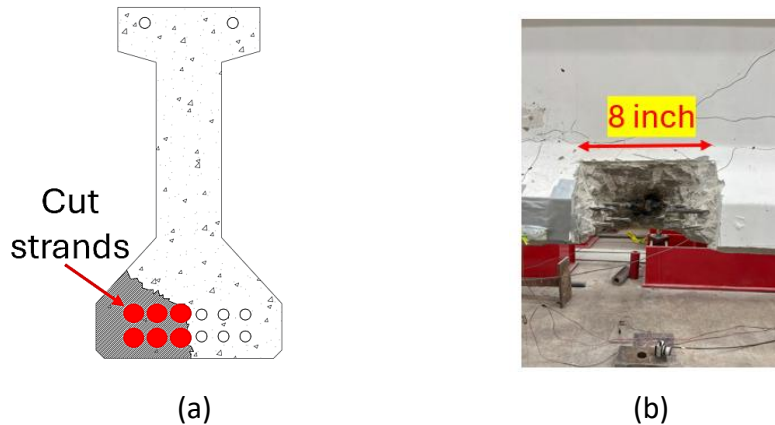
Girder G04, (a) Cross section showing loss of strands, (b) The section along the girder where strands were cut before the flexural test
